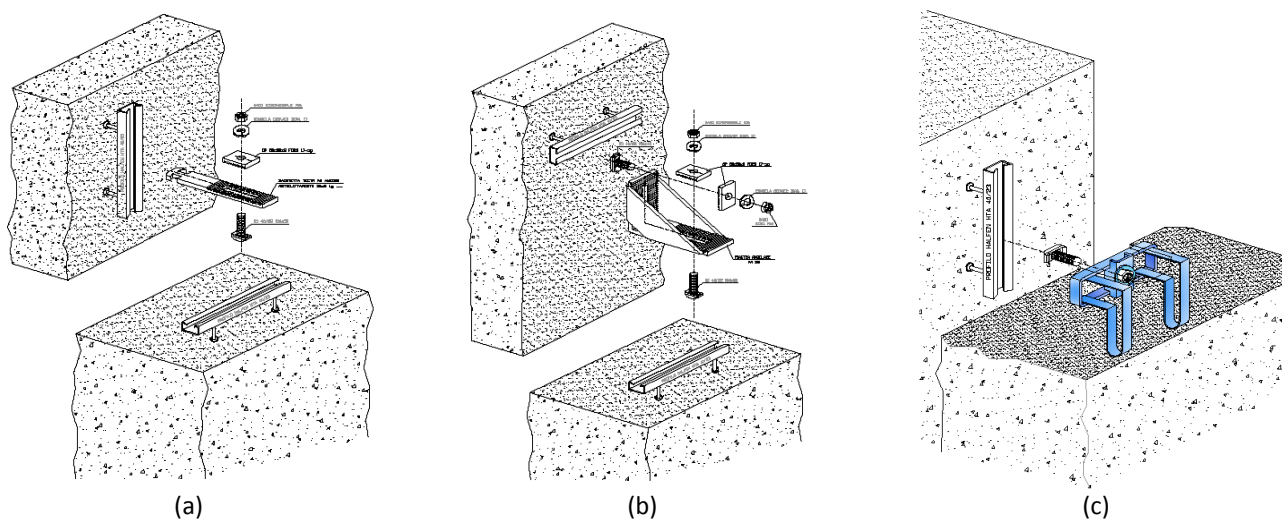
Sliding Bearing Connections: (a) sliding in both directions; (b) sliding in one direction with steel angle; (c) sliding in one direction with special box embedment (courtesy of Halfen).
